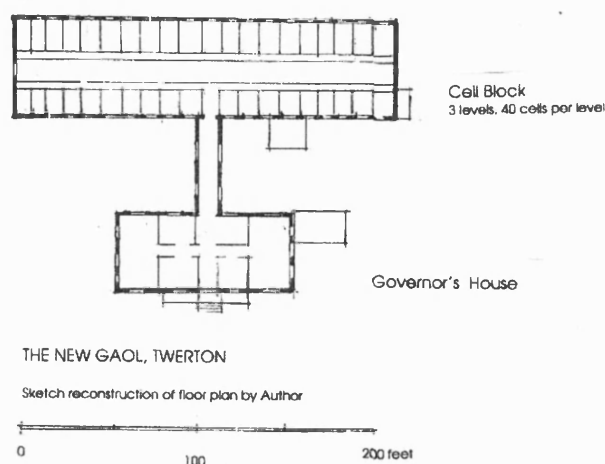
Twerton Gaol. Author's reconstruction of layout.
